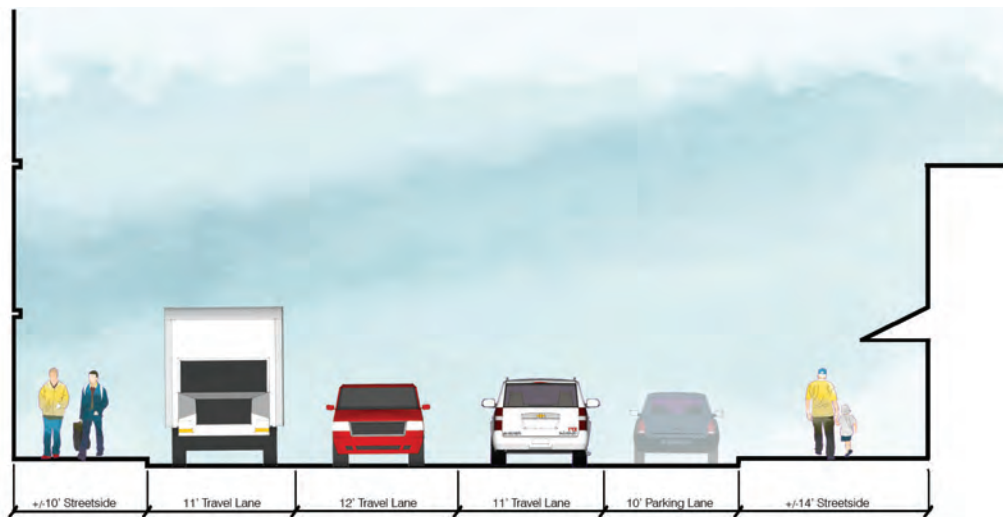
Flores Existing Cross Section – Old Guilbeau to Nueva
